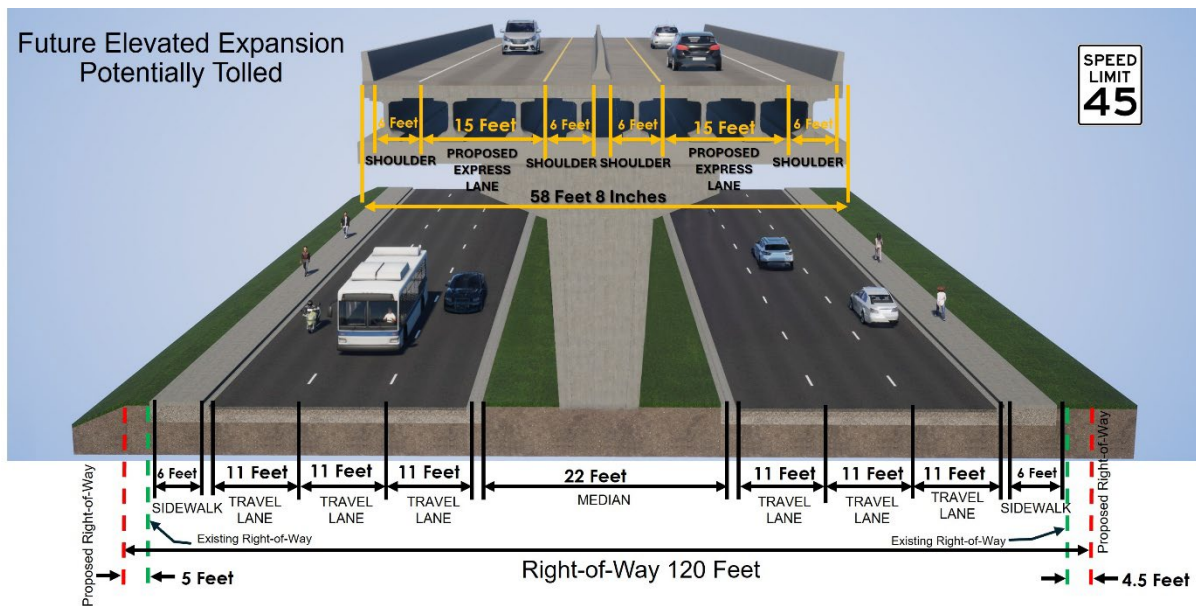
Preferred Roadway Typical Section: South of DeSoto Bridge
